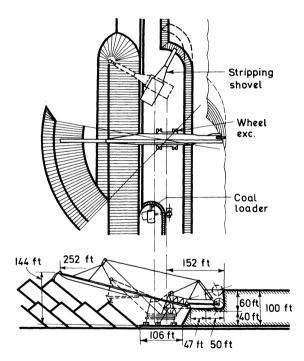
Pit plan for wheel excavator puts the shovel in the lead, digging rock bench left by the wheel in the previous pass.⁽²⁾
